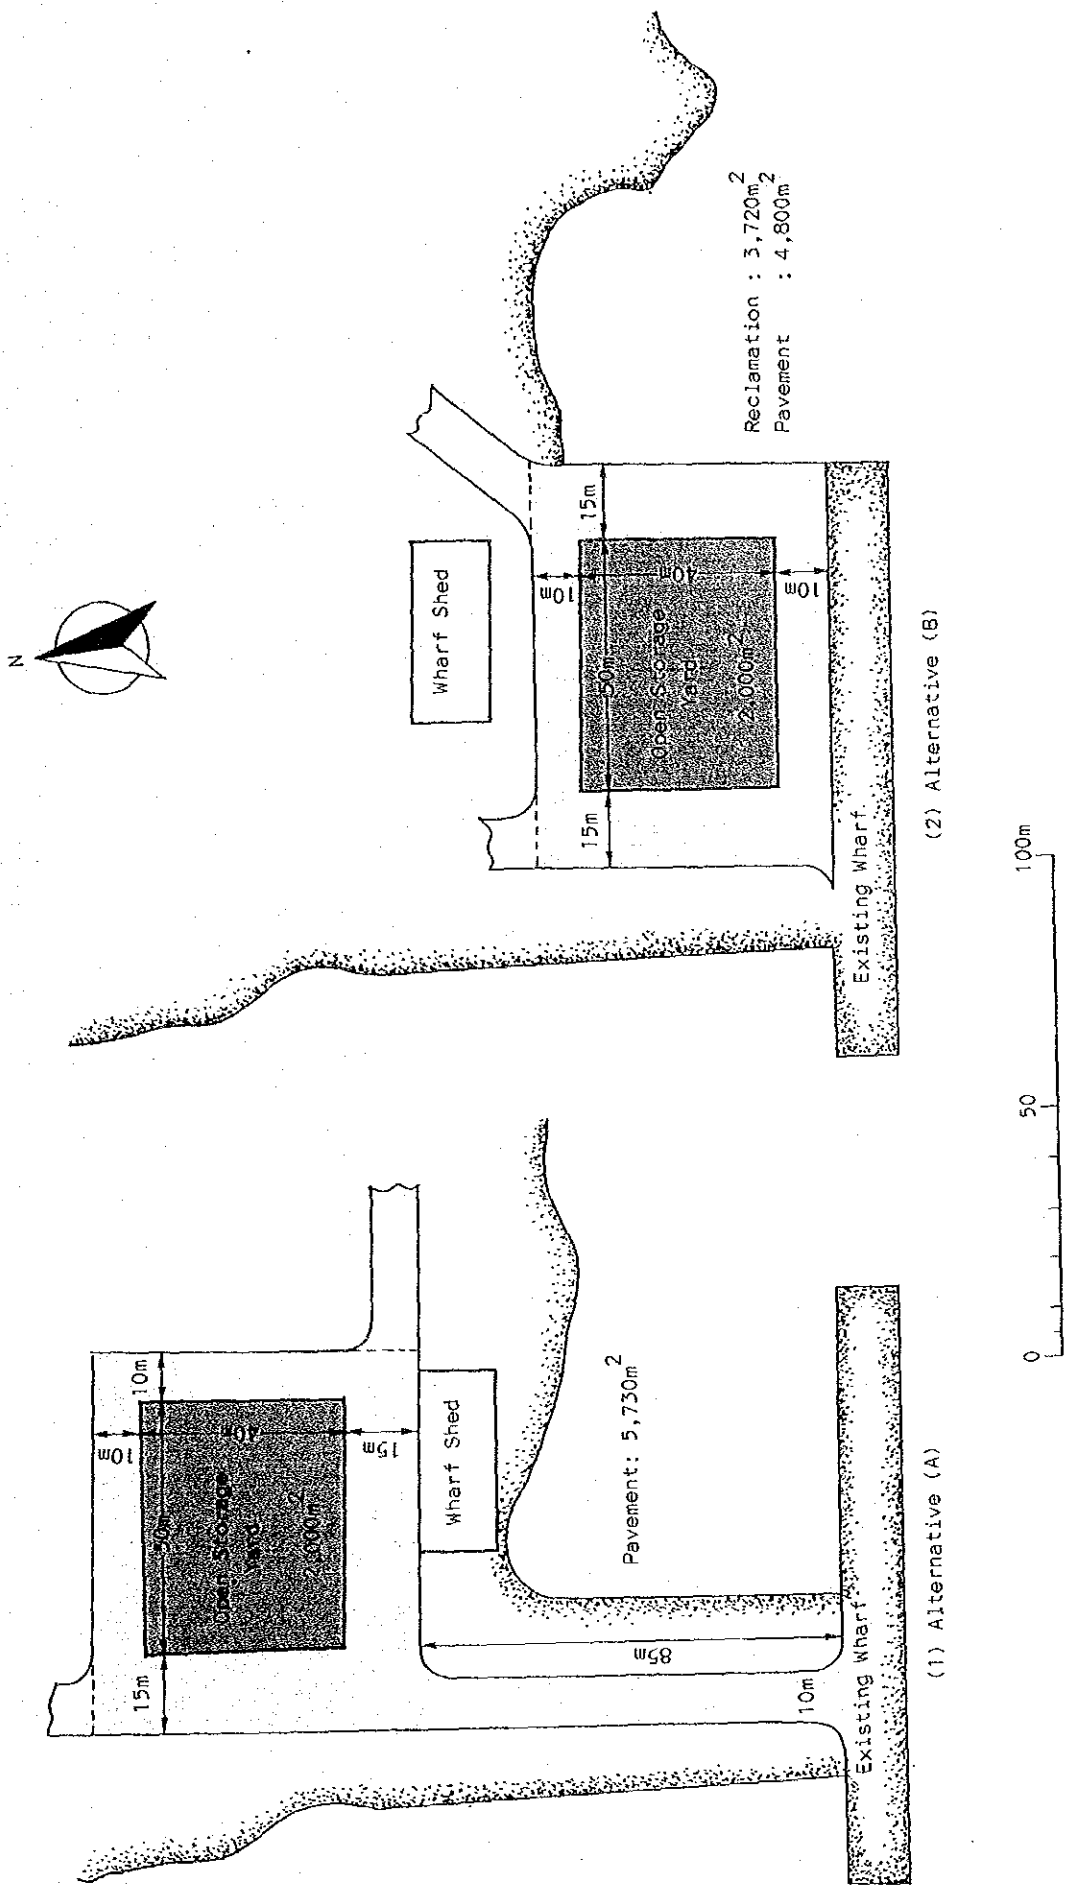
Layout of the Open Storage Yard, Asau Port
